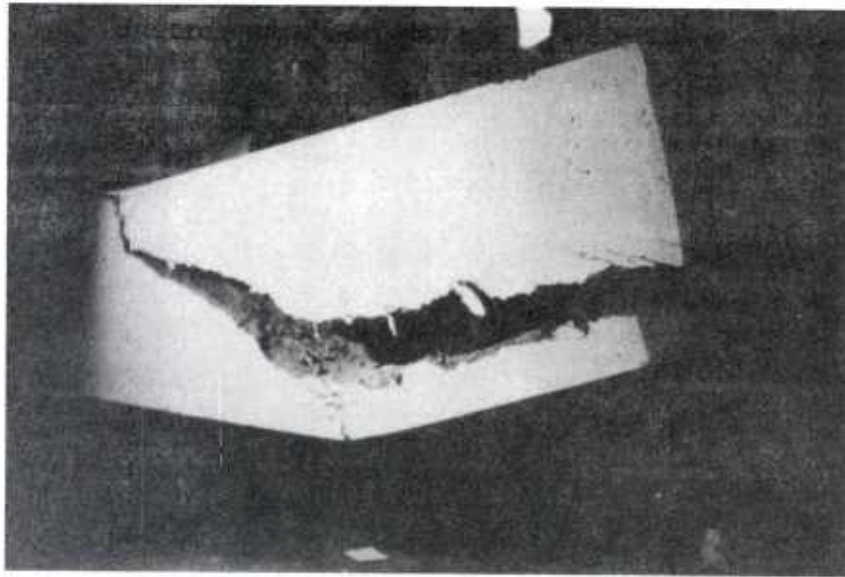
Diagonal Tension Failure of Fibrous Concrete Beam
